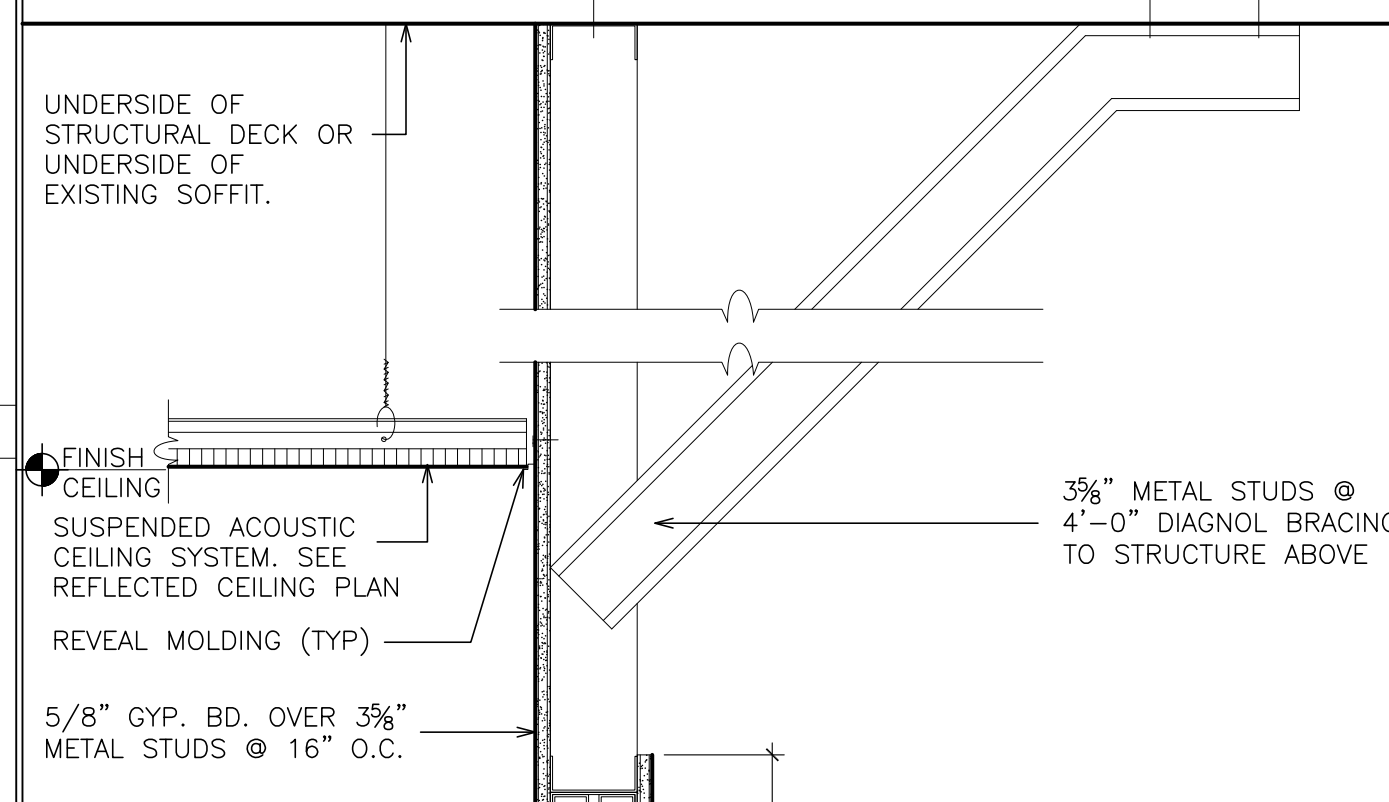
DETAIL - TRANSITION SOFFIT AND ACOUSTICAL CEILINGS
